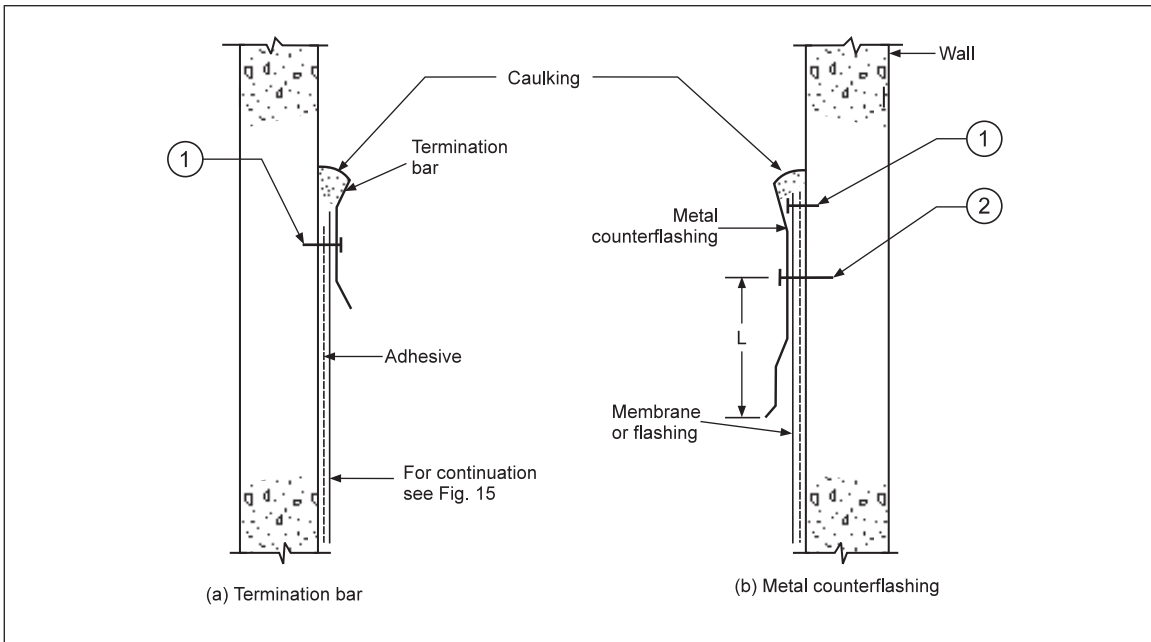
Single-ply membrane attachment to precast walls (where reglet was not formed)
